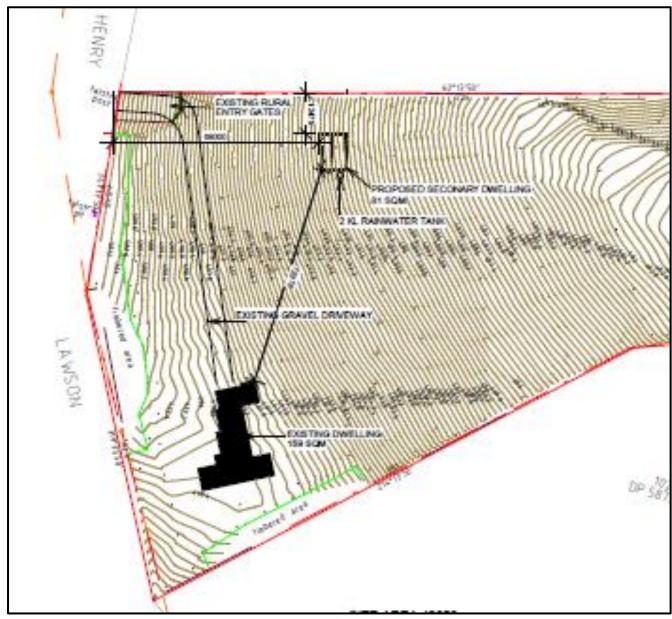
Site plan (1A) location of proposed secondary dwelling
